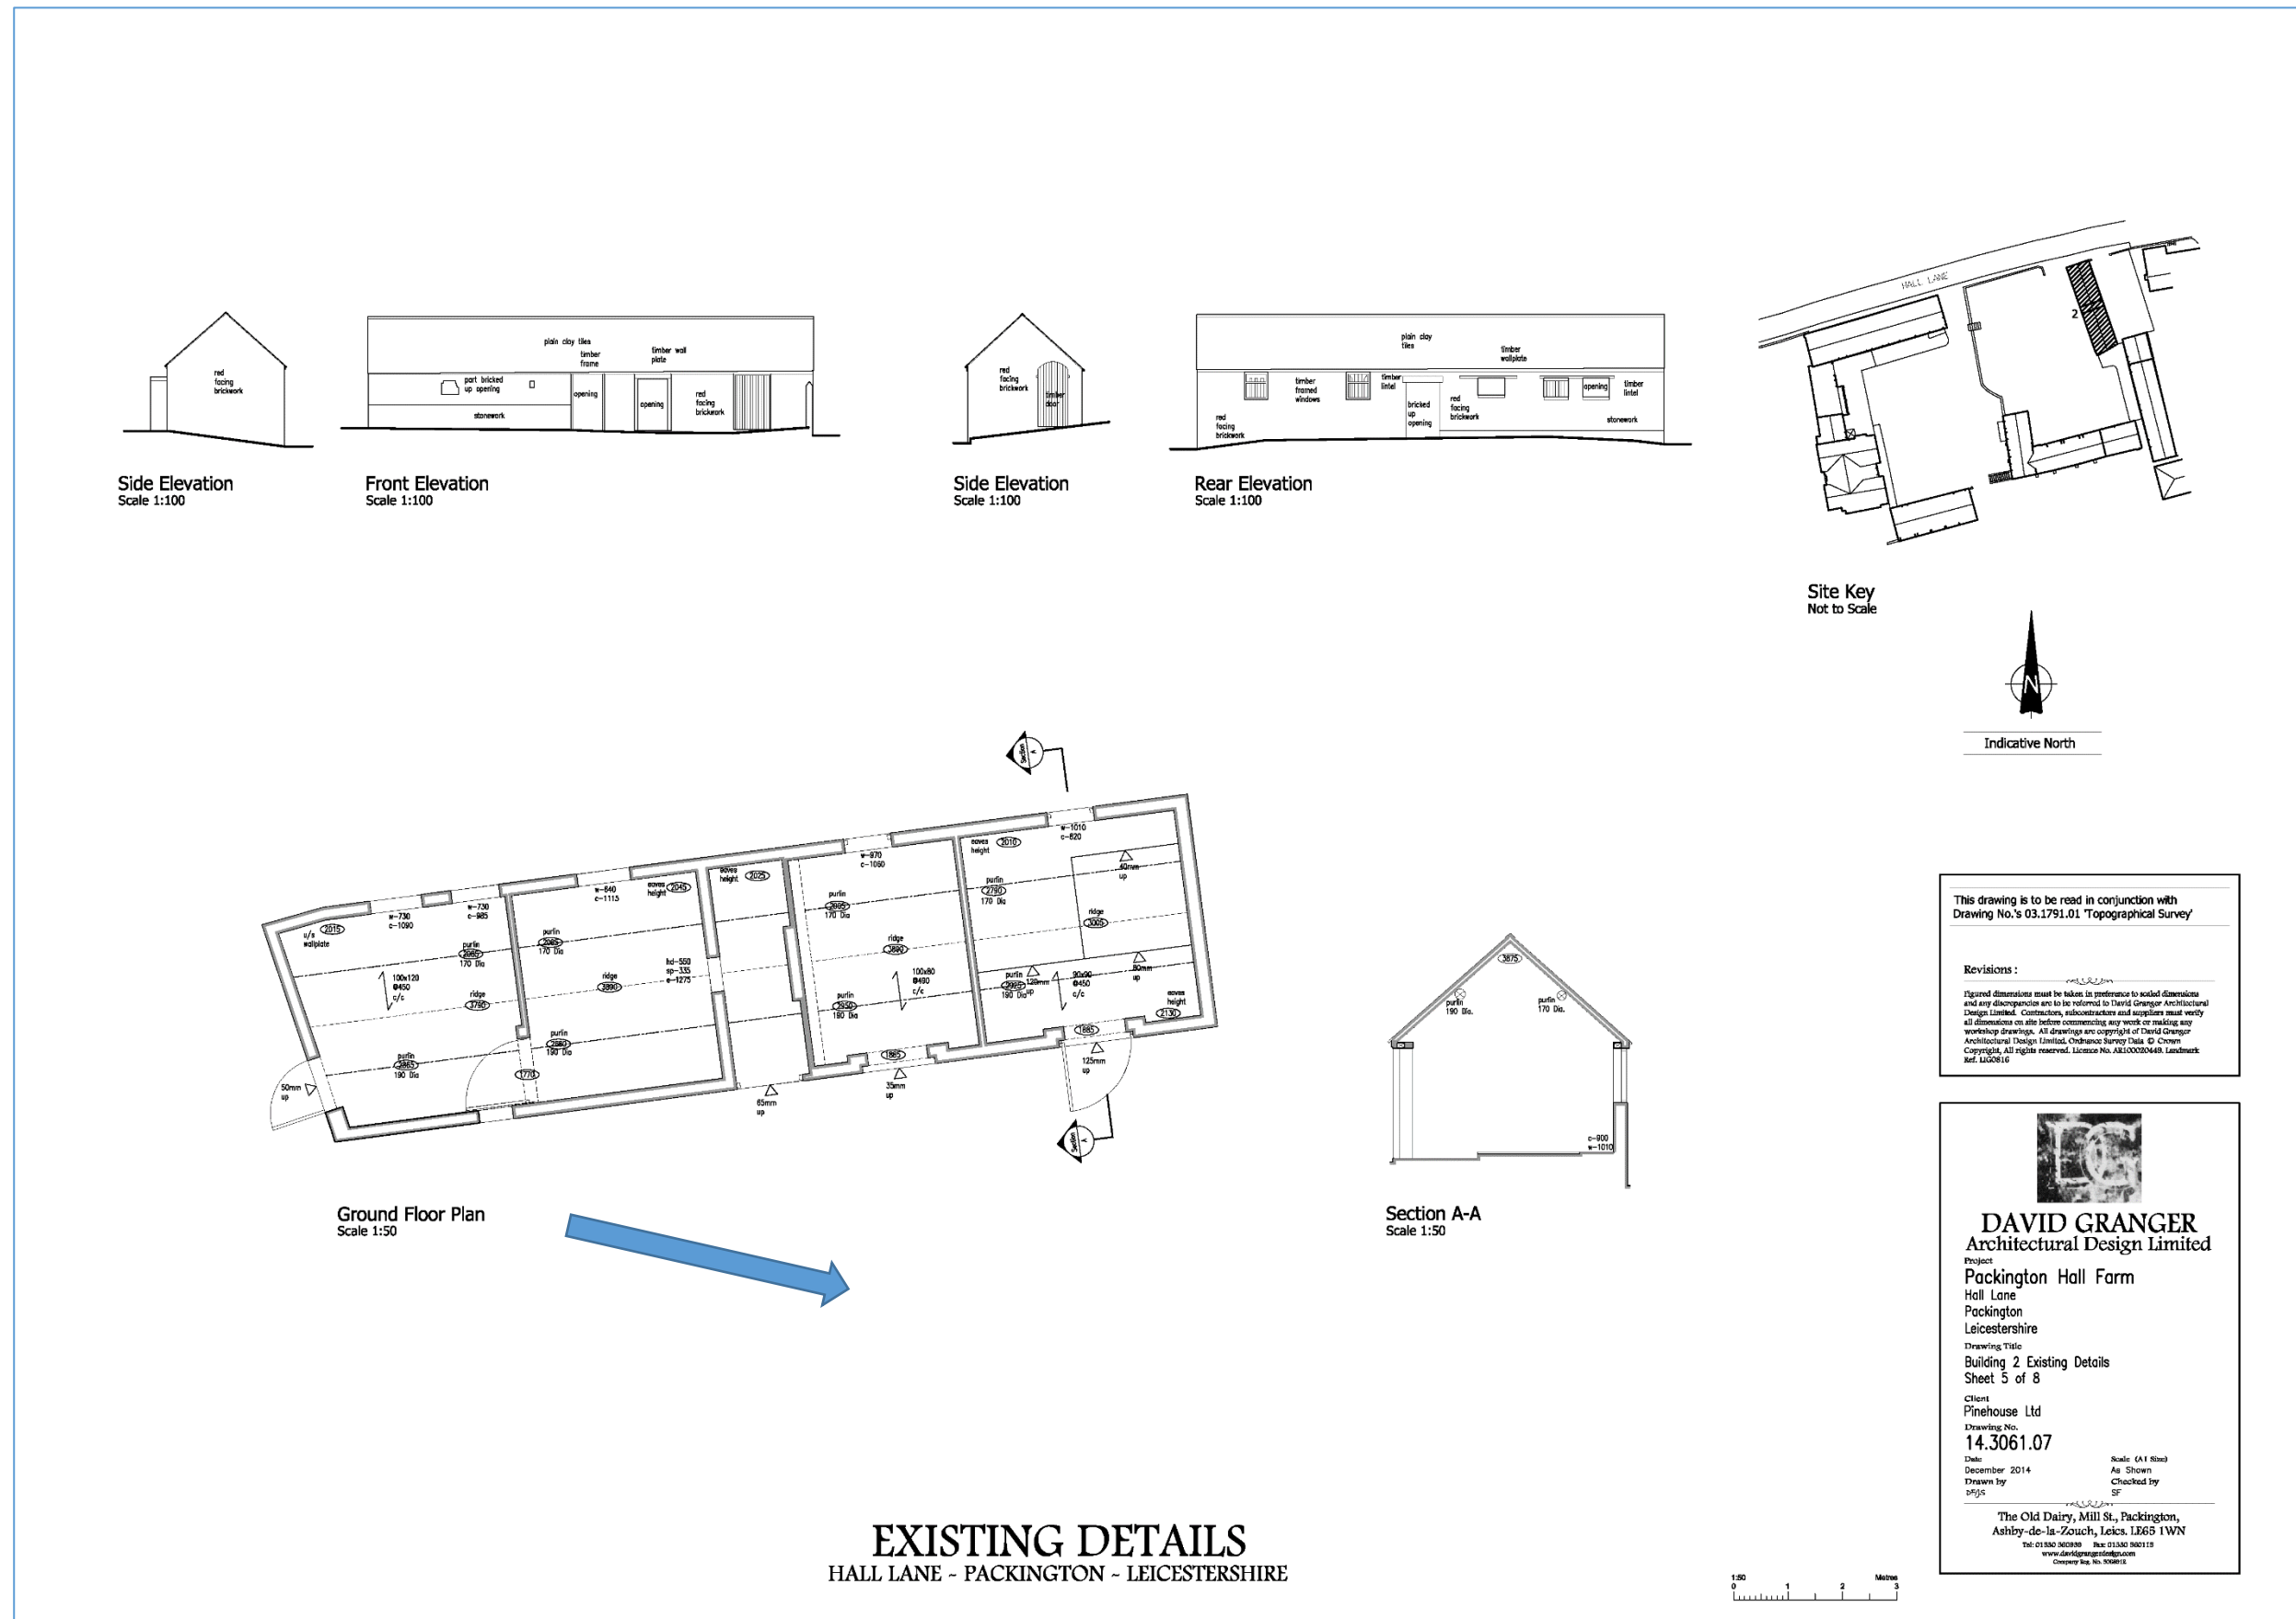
Blocks, A, G: elevations/sections. Provided by client
